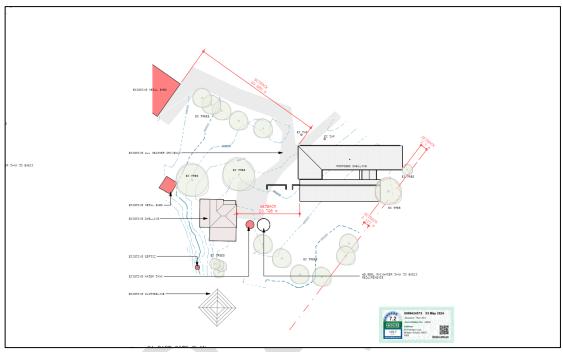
Proposed site plan (source: Cameron Anderson Architects)
